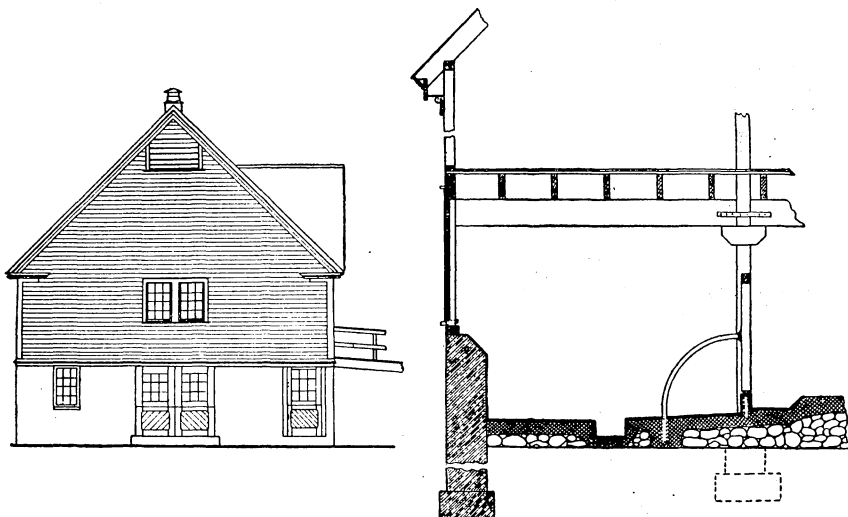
End elevation and detail of construction of stable shown in fig. 17.
